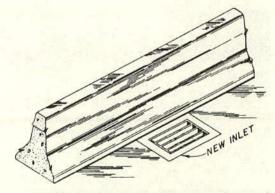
Inlet location for "New Jersey" type of barrier with pipe located below the structure.
